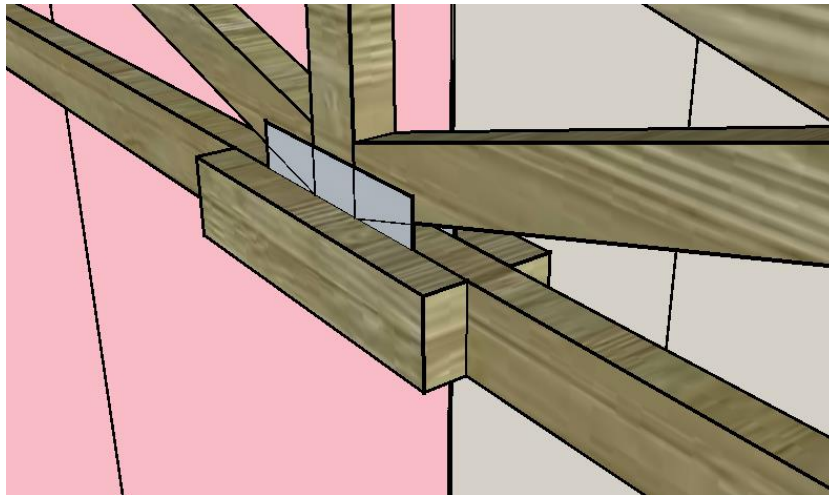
Experiment #2 3D sketch of roof truss with timber blocking protecting nail plate connection in truss
